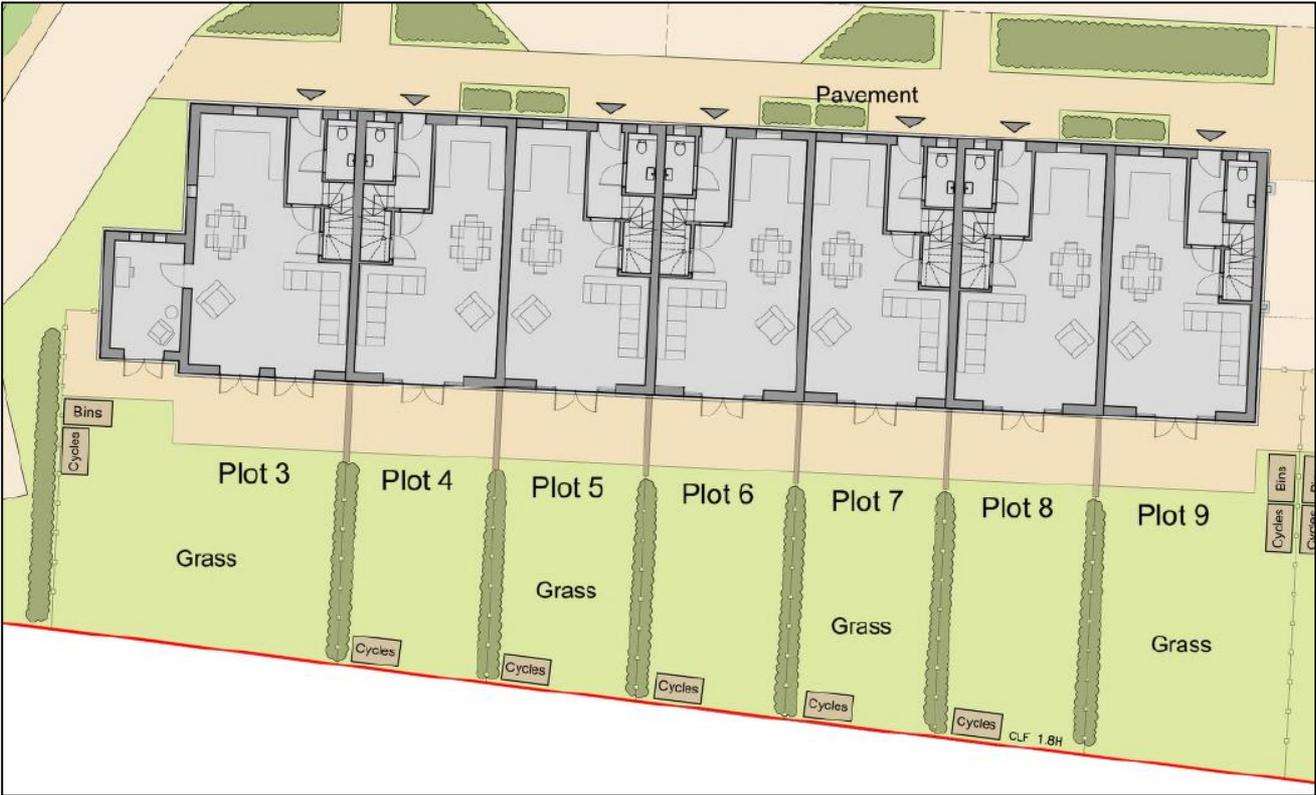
Ground Floor layout plan of the proposed Plots 3 to 9
